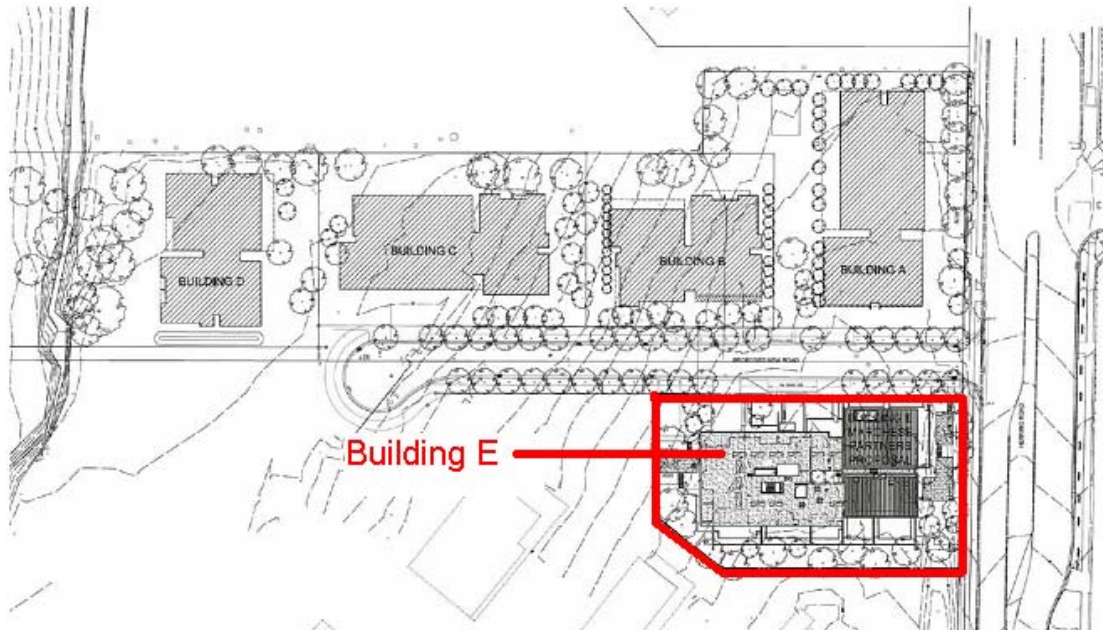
Site Plan showing the location of Building E in relation to Buildings A to D.
